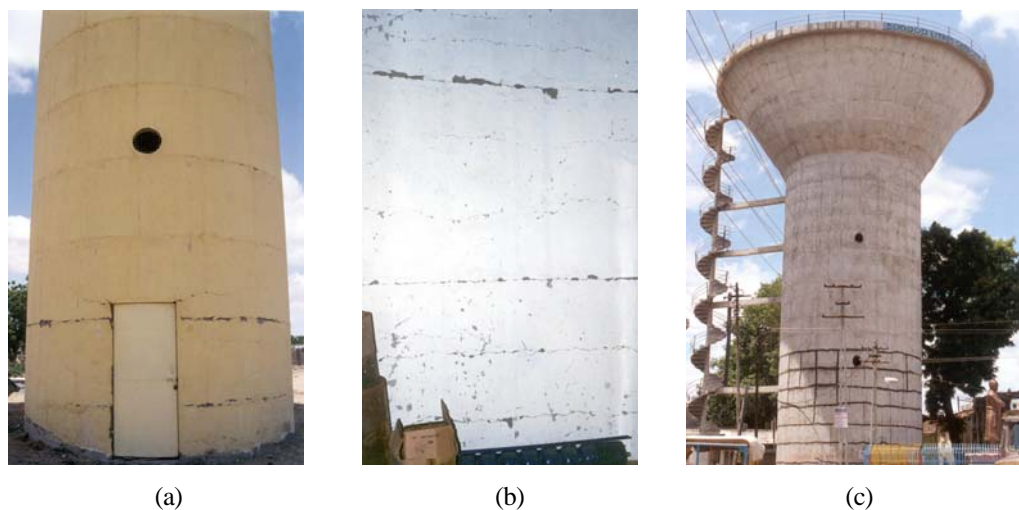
(a) 200 kL Bhachau water tank developed tension-flexural cracks up to one-third height of the staging. Severe cracking at the junctions of the first two ‘lift’, (b) Cracks are ‘through’ the shell thickness as seen from inside the shaft of 1000 kL Anjar Nagar Palika Tank, and (c) Cracks in staging of 500 kL tank repaired by injecting epoxy. This tank in Morbi, 80 km away from the epicenter, was empty at the time of the earthquake
